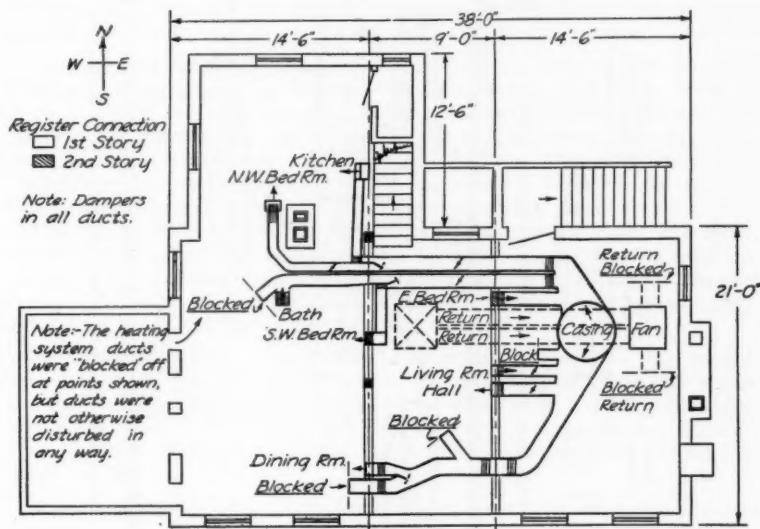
BASEMENT PLAN SHOWING DUCT LAYOUT FOR FORCED-AIR SYSTEM IN USE FOR DISTRIBUTING COOL AIR
